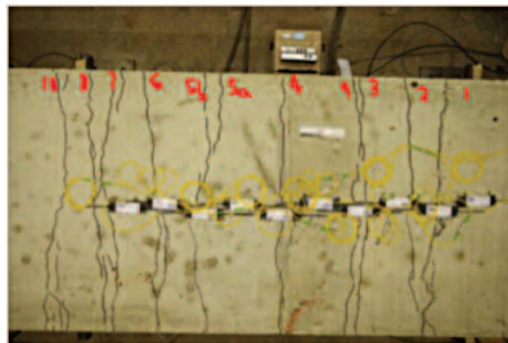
Wide beam testing exhibiting multi cracking for the SFRC tunnel lining
